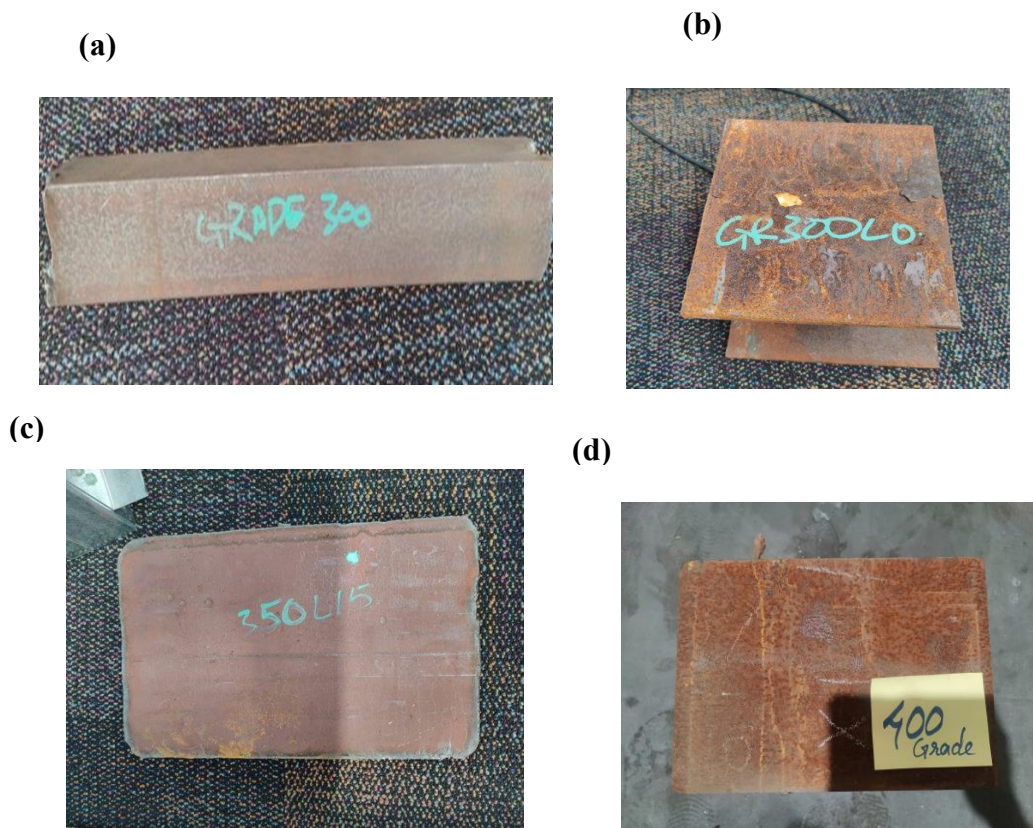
Different grades of received steel specimens (a) 300 grade angle, (b) 300 I section, (c) 350 plate sections, (d) 400 Rectangular Section
